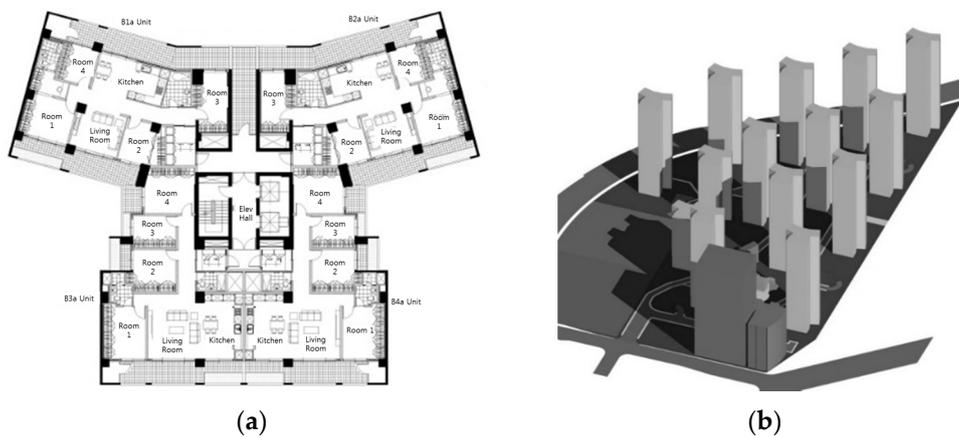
The plan drawing and bird's eye view of the reference floor of the alternative case. (a) reference floor plan drawing; (b) aerial view.
